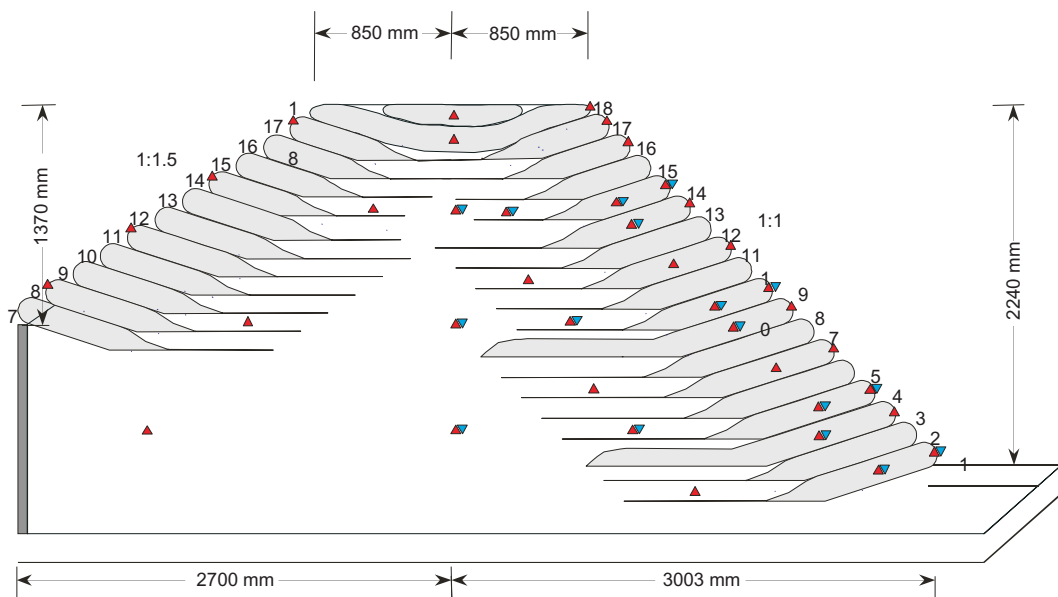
Cross-section of GSET reinforced earth dam (inclined model)
